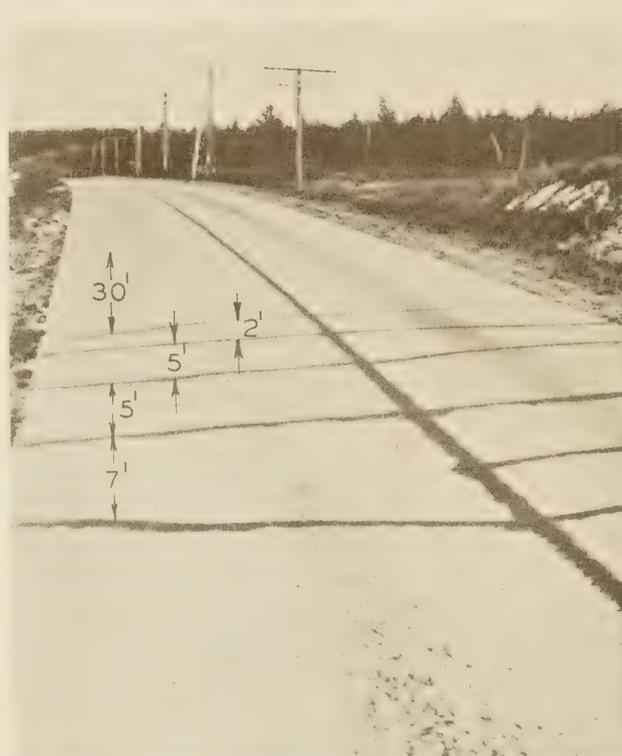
CRACKING IN CONCRETE PAVEMENT DUE TO FROST HEAVE.
